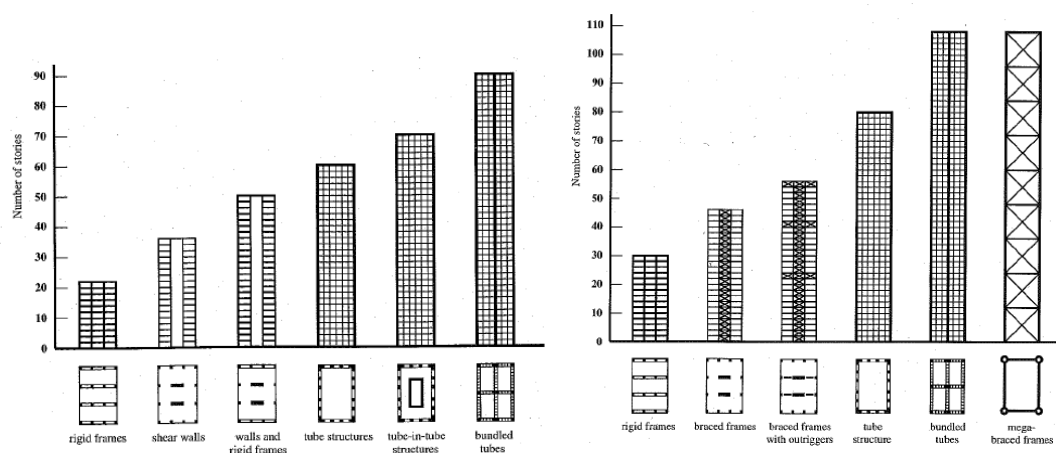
and 2.2: Reinforced concrete (left) and steel (right) loading bearing structures [Hoenderkamp, J.C.D, 2007]
